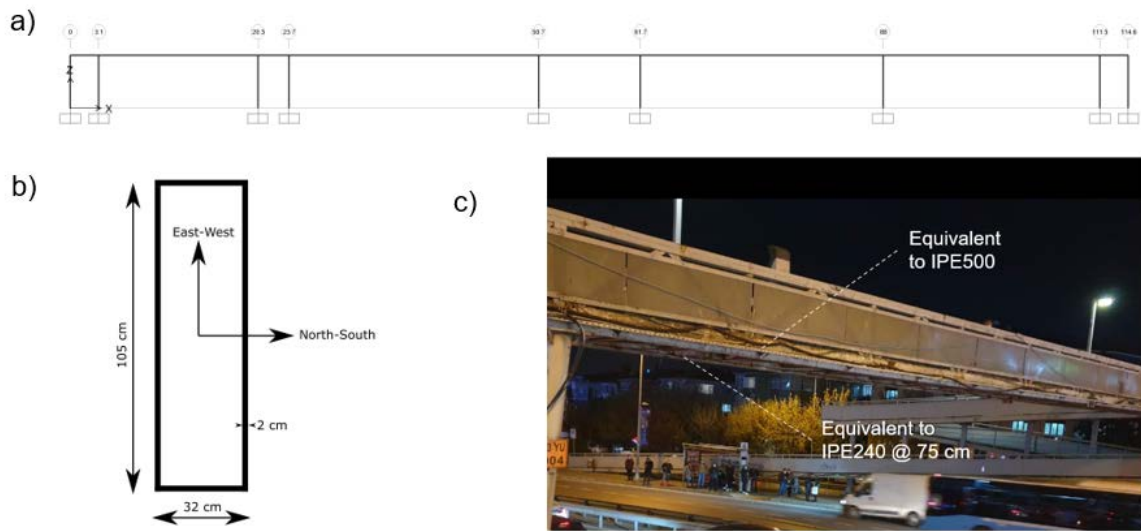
a) Cross-section of the bridge in the North-South direction, b) the cross-section dimensions of the columns used in the analysis and c) the profiles that form the deck.
